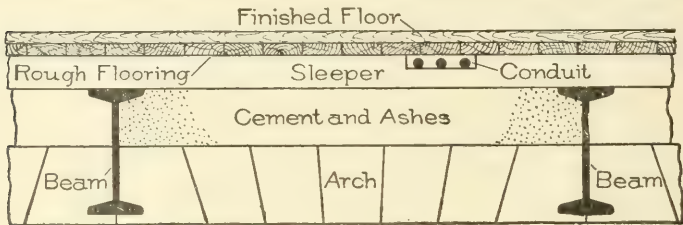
Running Conductors Concealed under Floor in Fireproof Building.
